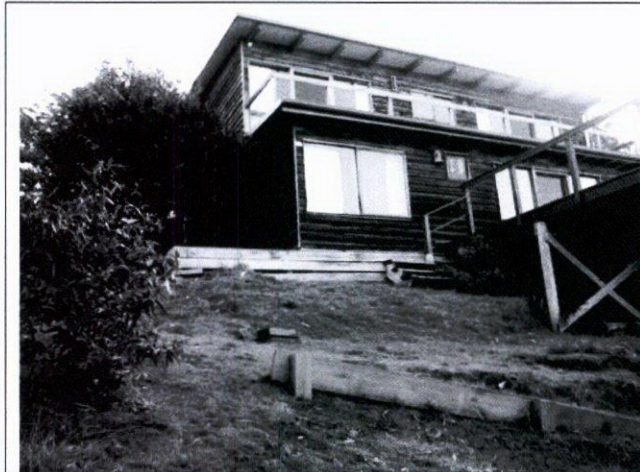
View of the existing dwelling overlooking the proposed building envelope.
